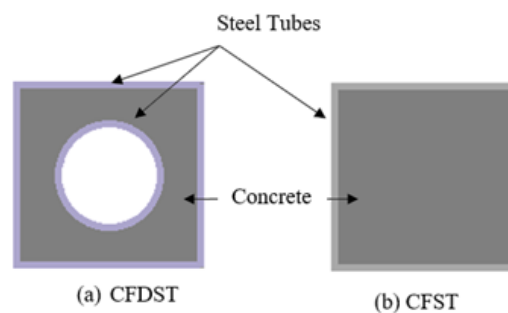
(a) Concrete filled Double skin Tube (CFDST) section and (b) Concrete Filled Skin Tube Section (CFST).
